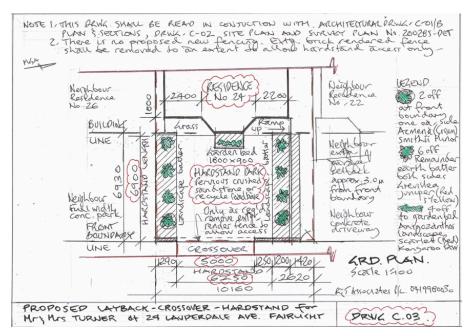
Stamped Plan of front hardstand parking area facing Lauderdale Ave (Russell Turner)
